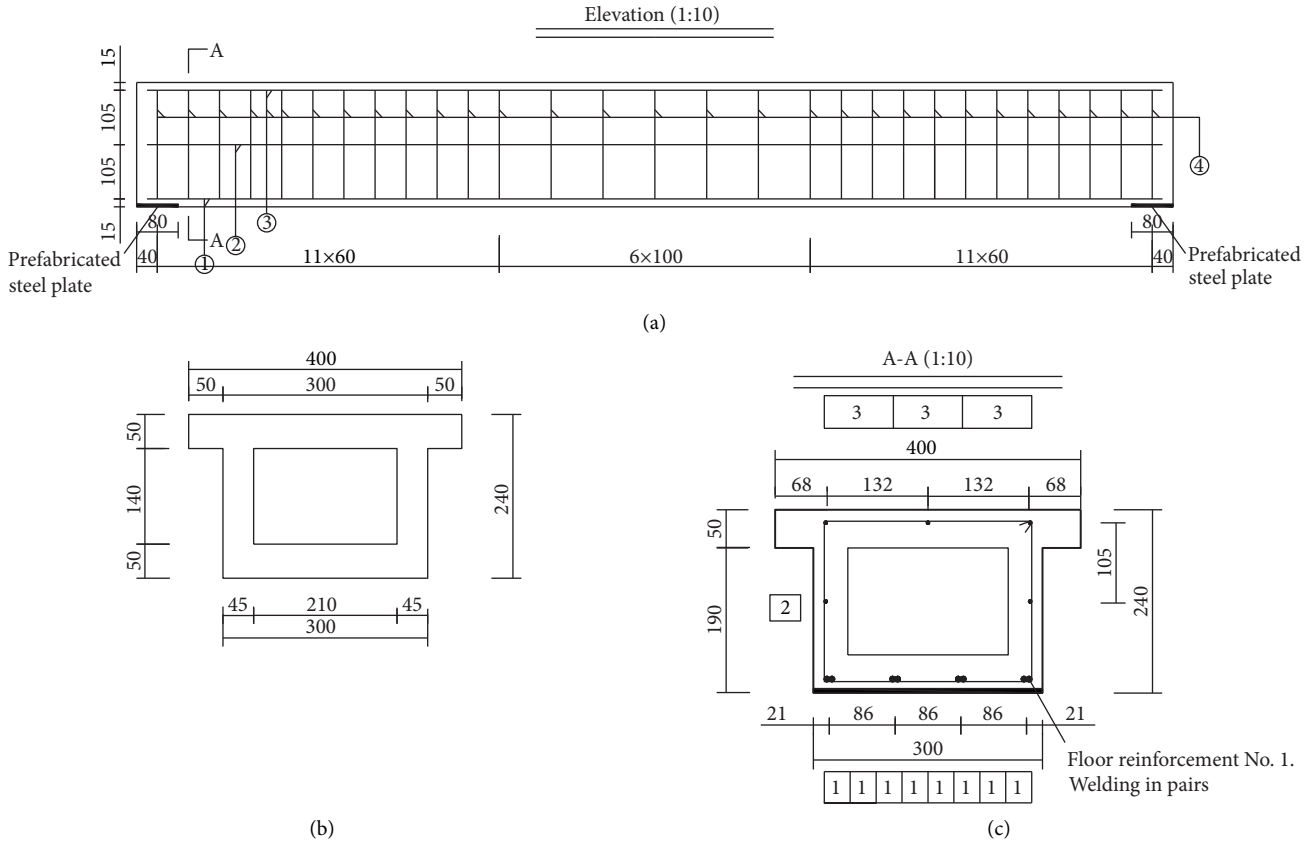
Section size and reinforcement arrangement of test beam (unit: mm). (a) Elevation. (b) Section. (c) Reinforcement layout.
